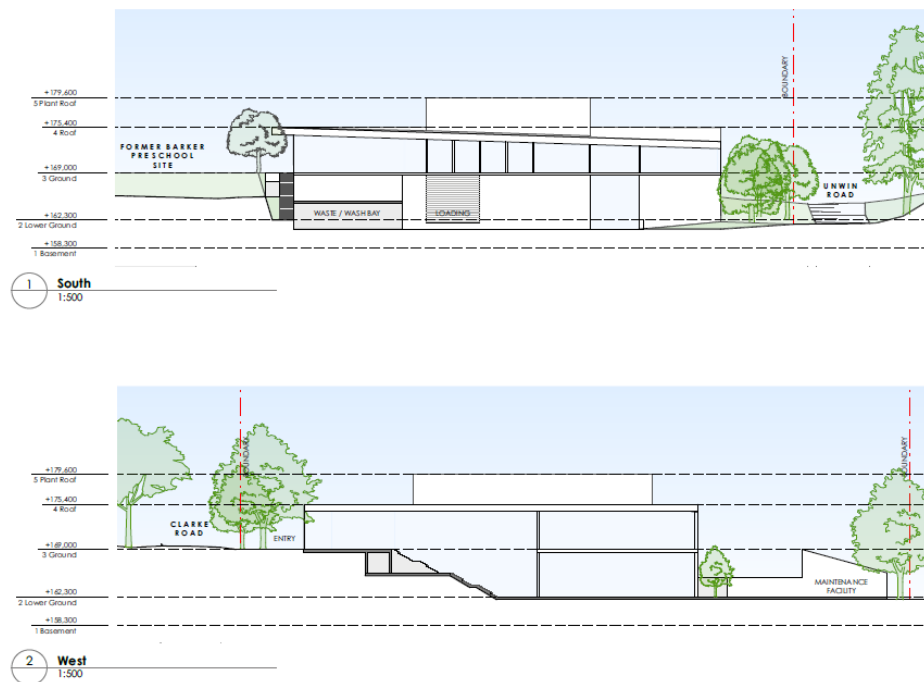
Elevations showing proposed additions to the south of Clarke Road. (Source: Neeson Murcutt + Neille)
